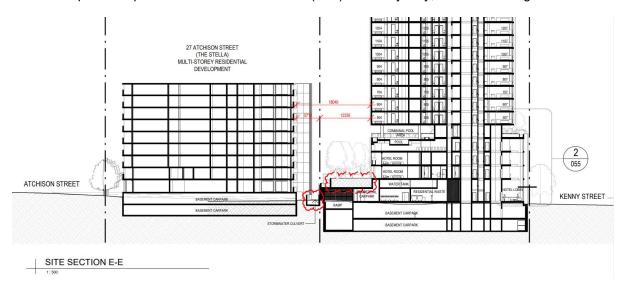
Section showing relationship of building to rear boundary and adjoining building at 27 Atchison Street
